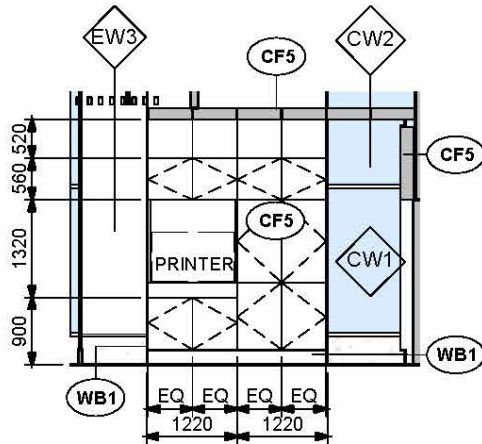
Section elevation of Station Ambassador Office showing millwork cabinet
